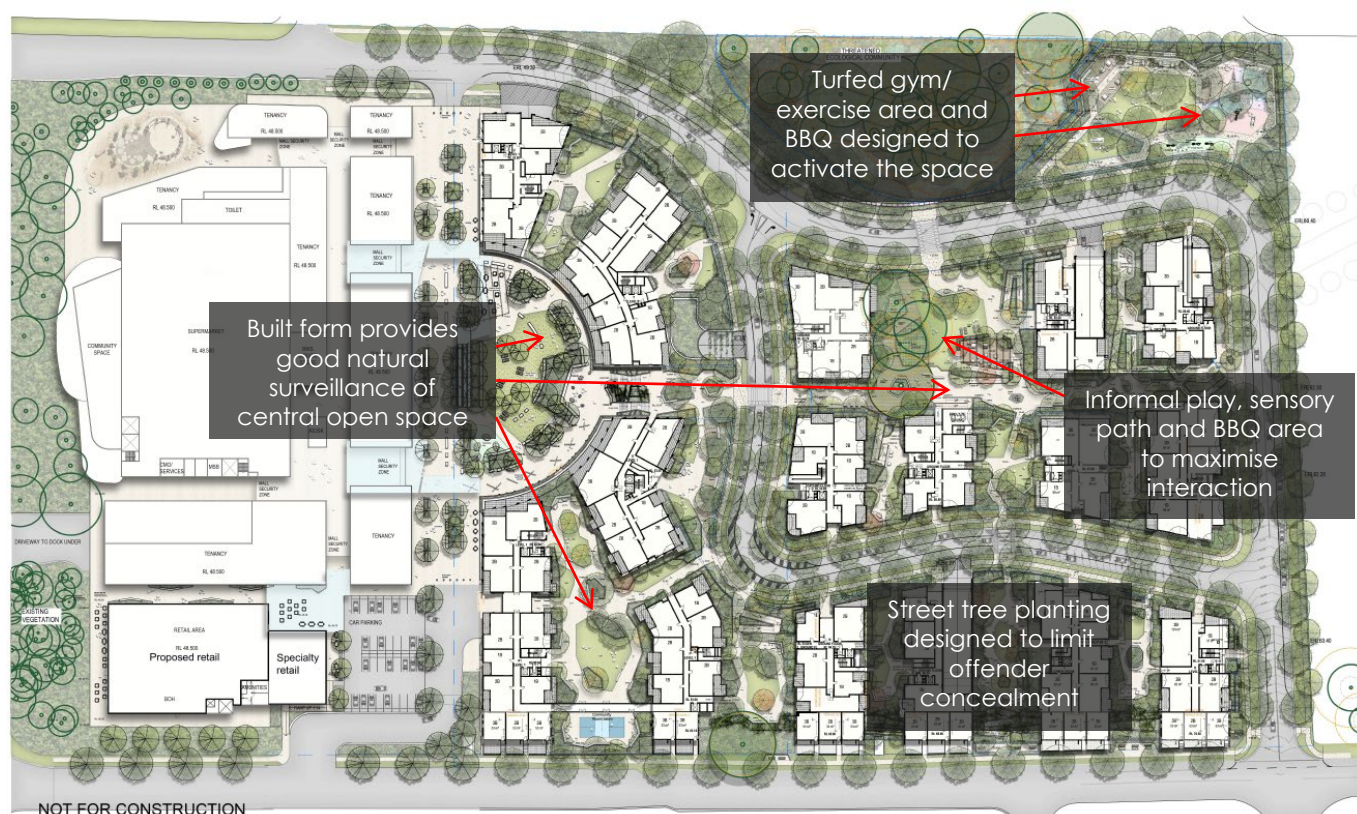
Landscaping Masterplan (Source: Site Image Landscape Architects, 2025)
